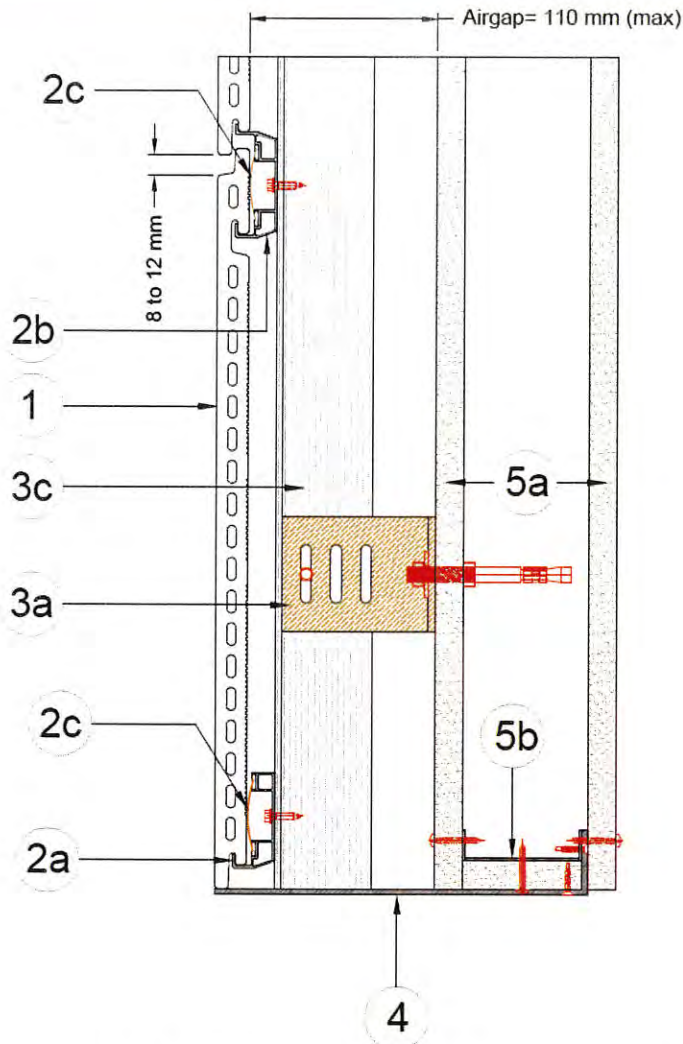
Non-load-bearing exterior wall cladding assembly typical vertical joint and window section details
